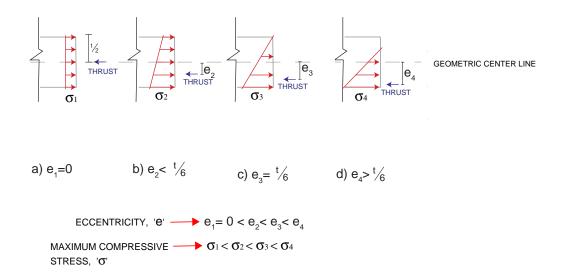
STRESS DISTRIBUTION DUE TO ECCENTRIC LOADING
